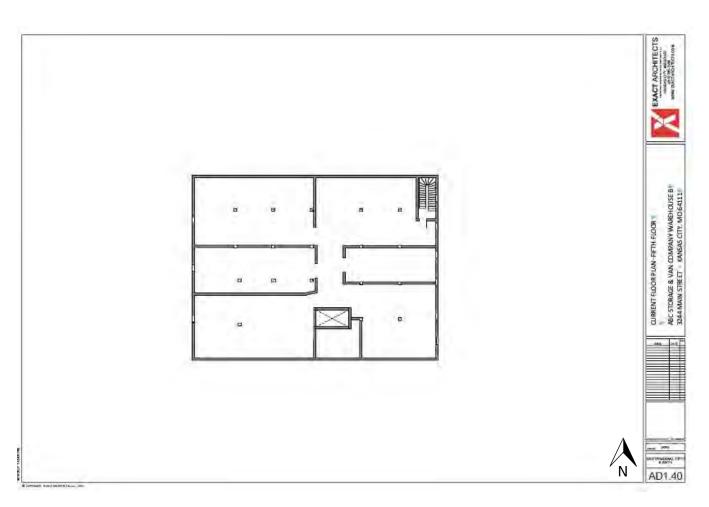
ABC Storage & Van Company Warehouse B current floor plan, fifth floor Source: Exact Architects.
